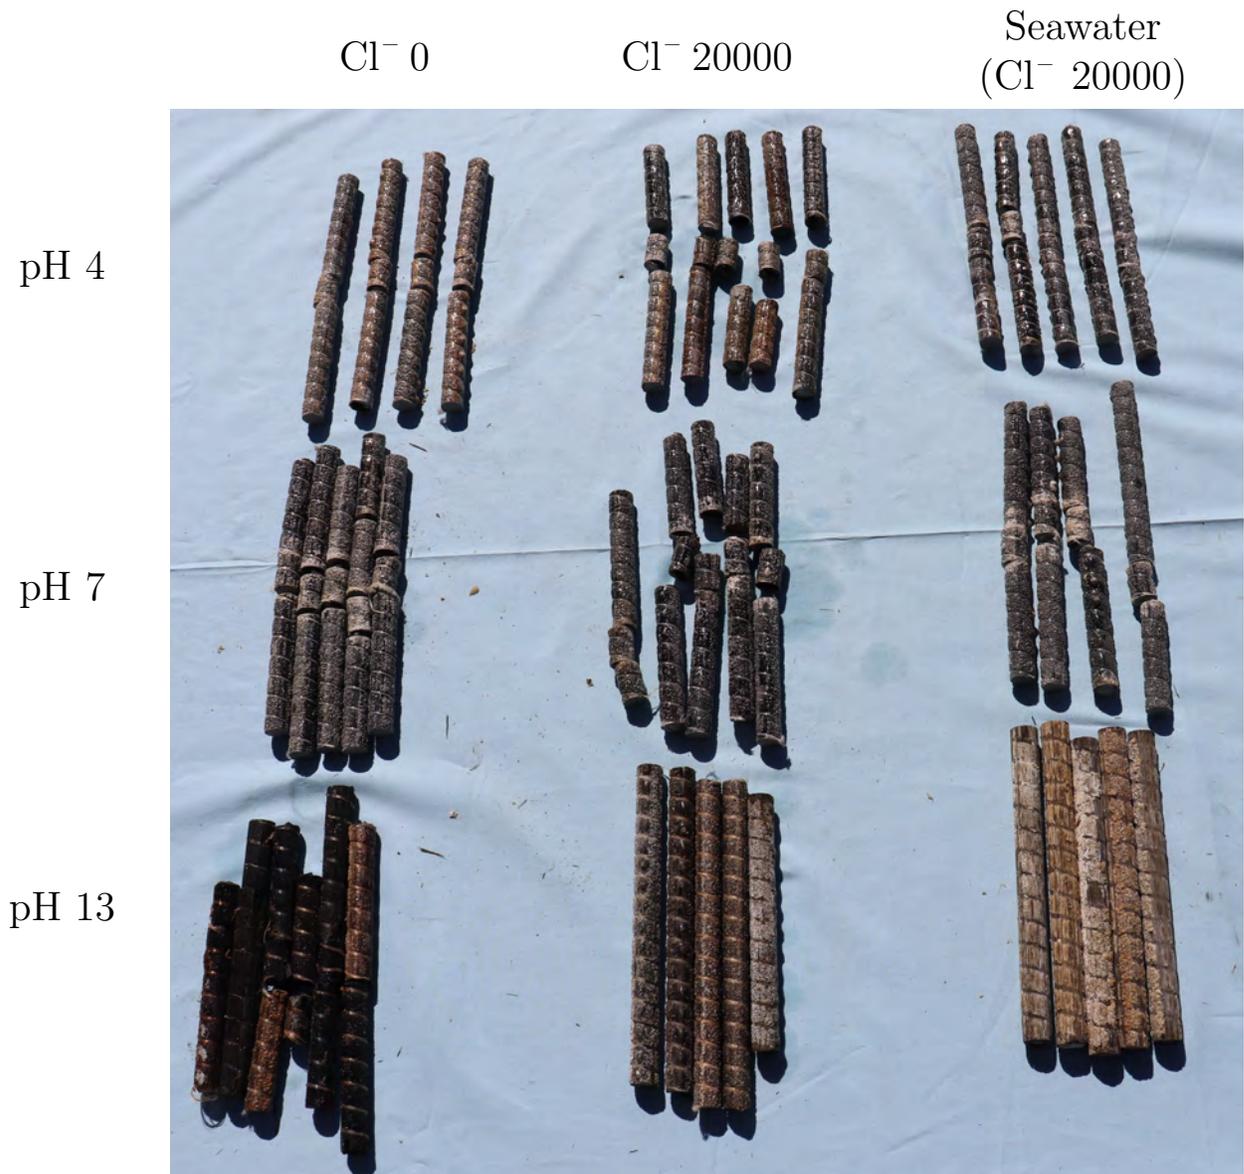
Transverse shear failure mode of Type A # 5 rebars
